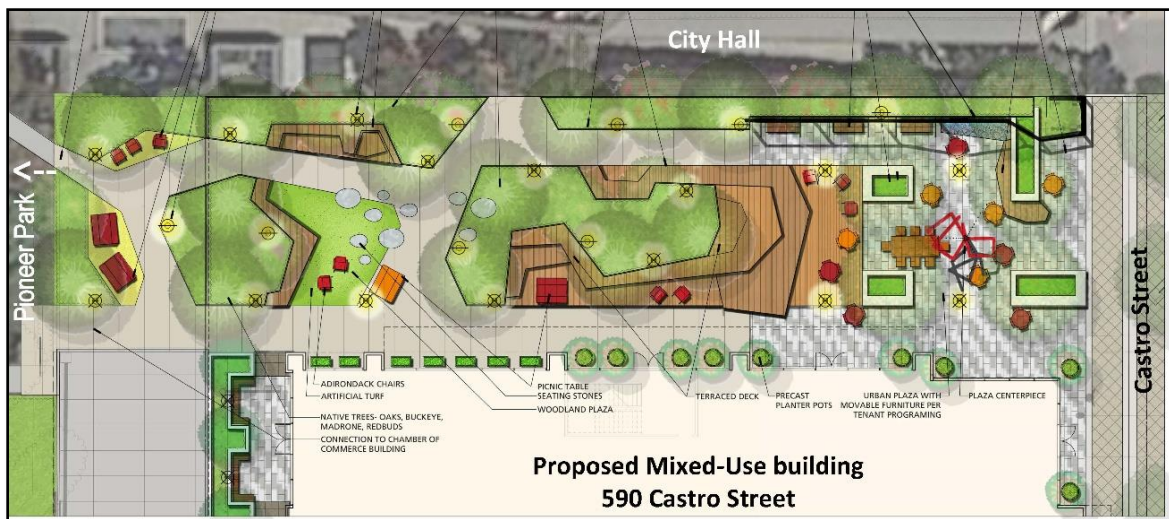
Proposed Landscape Plaza Connection Between Pioneer Park and Castro Street
